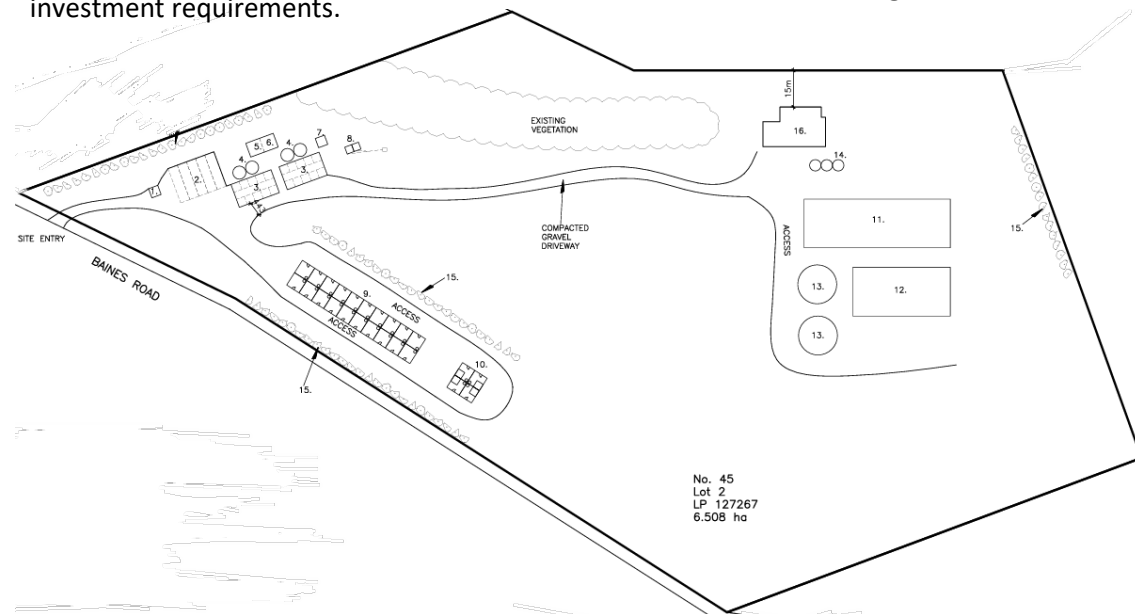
Farm Management Site Plan – Damian Anderson Drafting and Design
